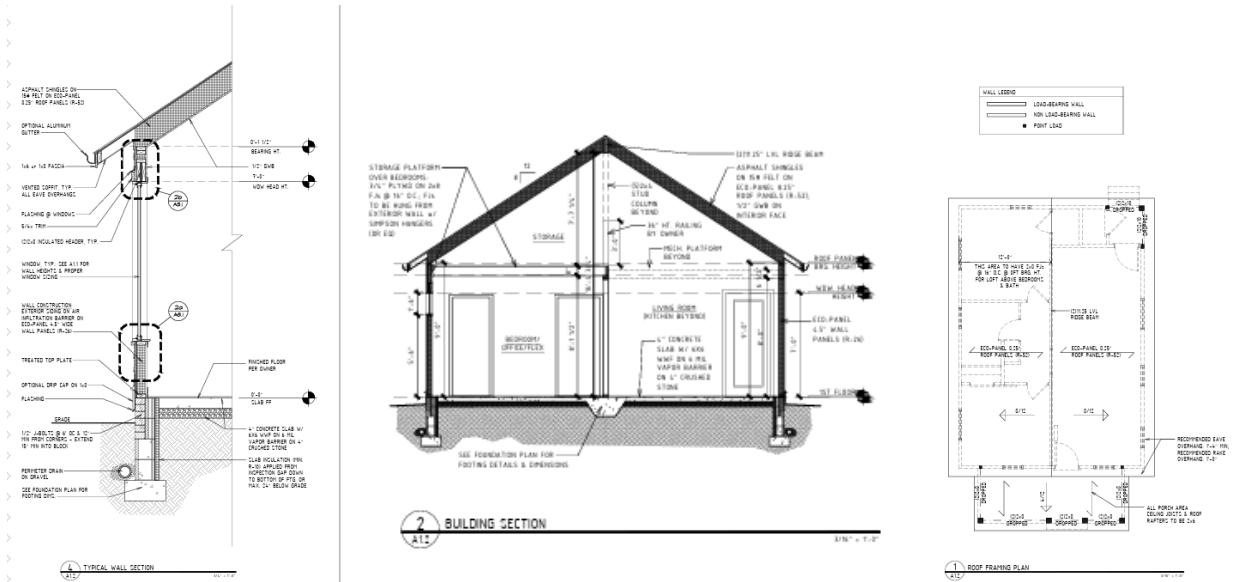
Howard Building Science single-family production home STCBT pilot test: sections & roof plan
